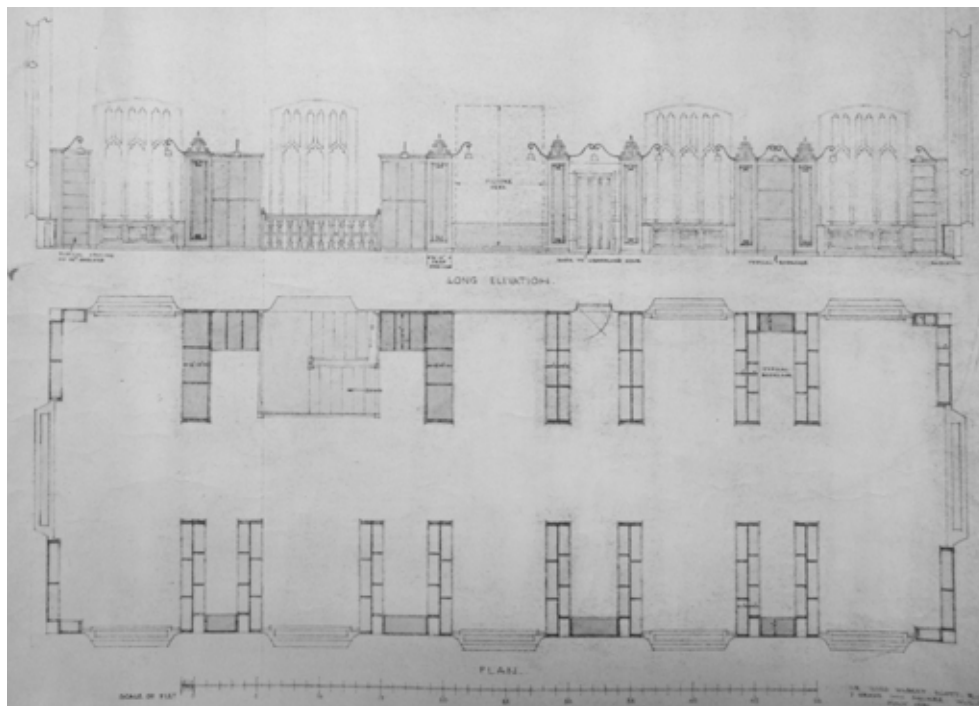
Plan and elevation of the reading room at Magdalen College Library. Magdalen College Archives.
